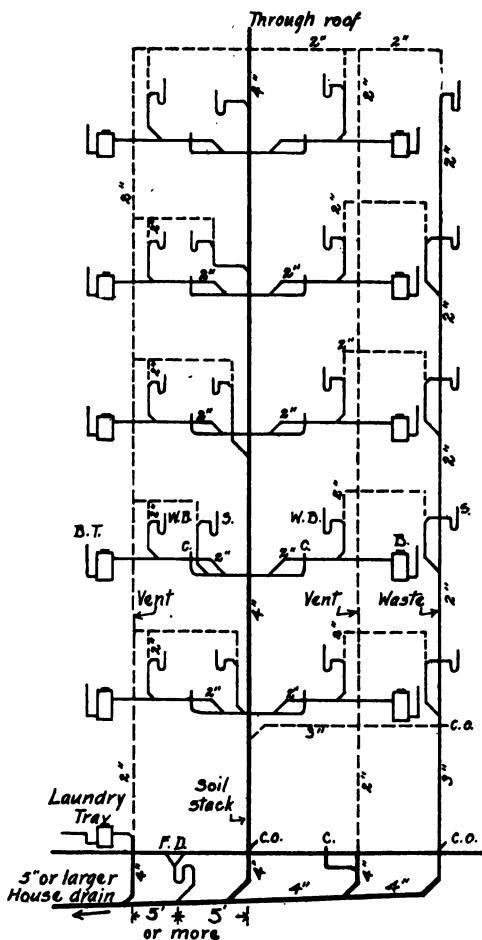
Illustrating minimum requirements for duplex flat installation.
